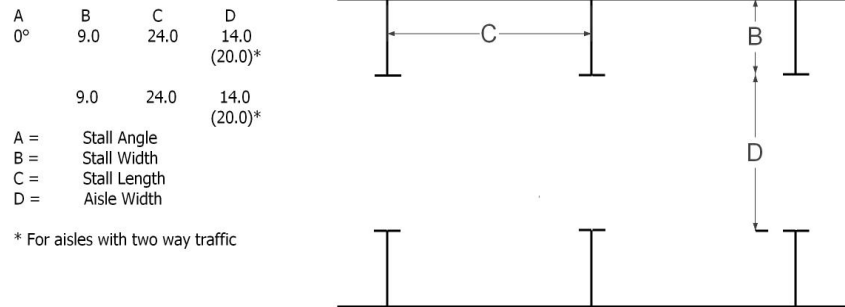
Parking layout dimensions at 0 degree angles (minimum standards)
